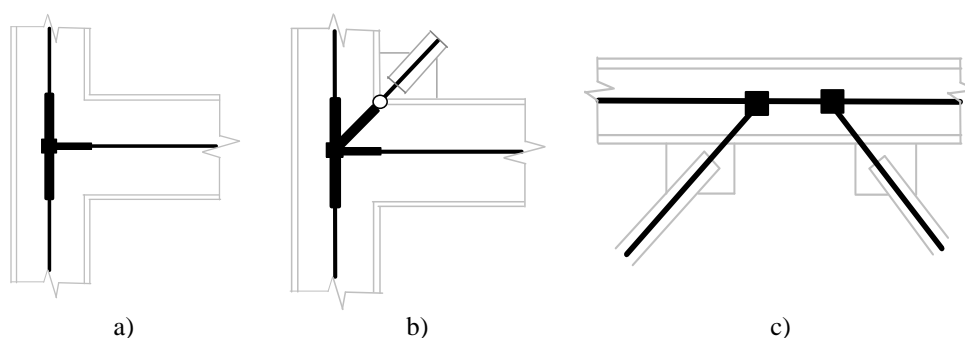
Model of connection types: beam-column joint (a), beam-brace column (b), brace link (c)
